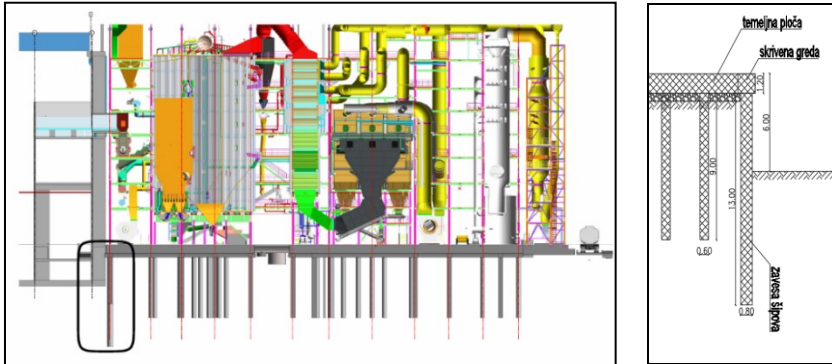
a) Cross-section of the Bunker Building and Waste Thermal Treatment Facility b) Cross-section of the foundation structure of the Waste Thermal Treatment Facility
